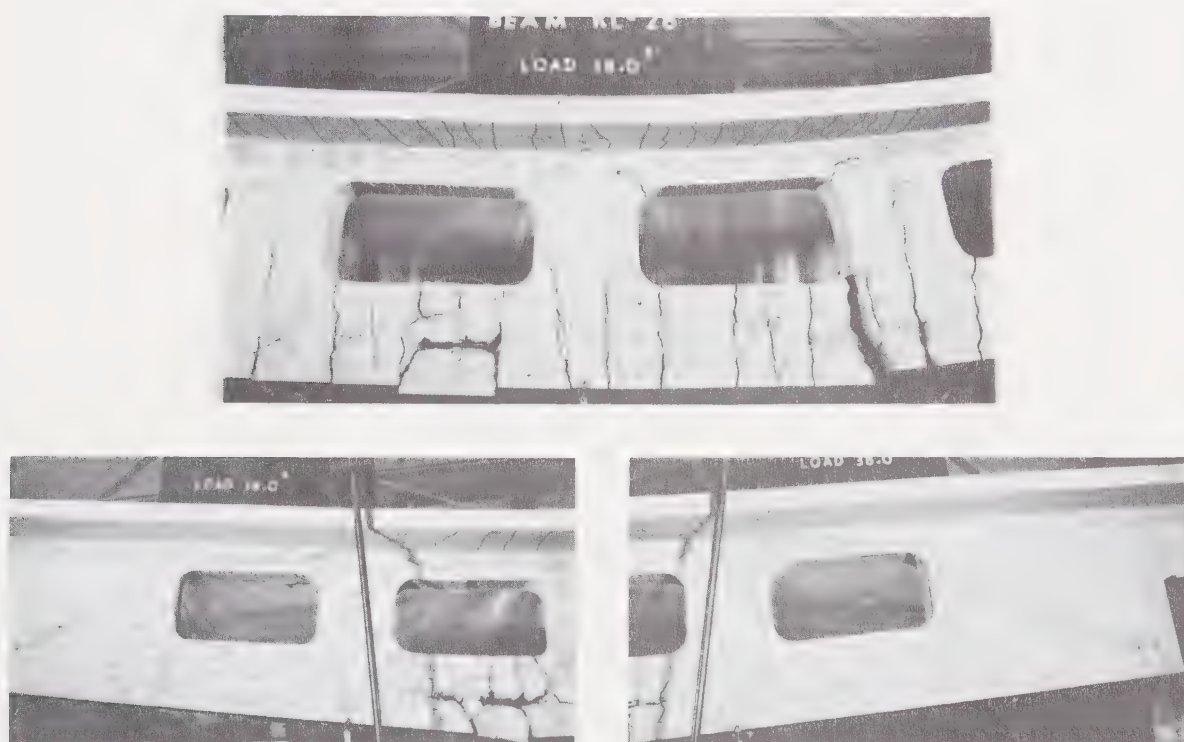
CRACKING AND FAILURE PATTERN OF BEAM 28-16-4
